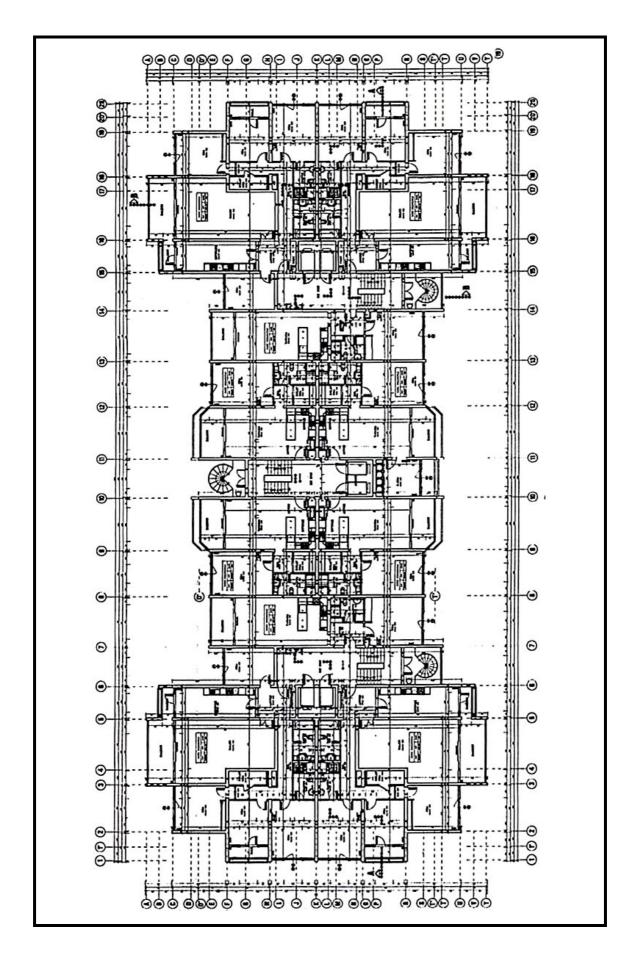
Mavişehir II; Kuğu 12th-Floor Plan
